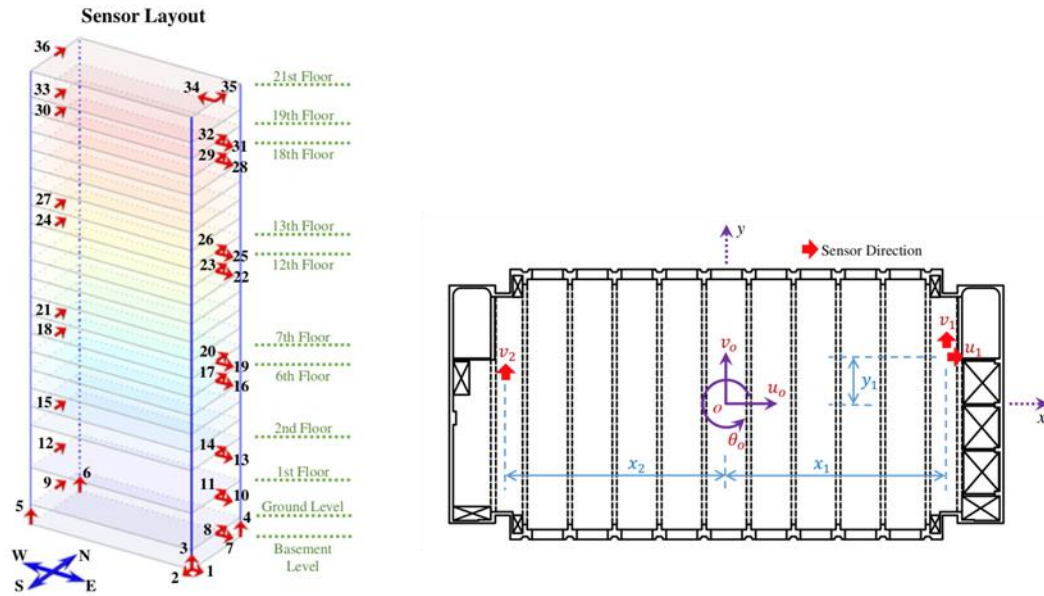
Instrumentation of the Green Building, and Sensor Locations at a Typical Floor, Sun and Buyukozturk (2018)
